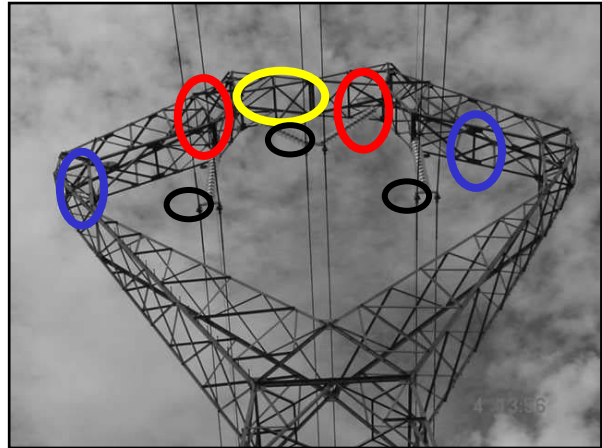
Visual inspection may reveal towers where backflashover have taken place
